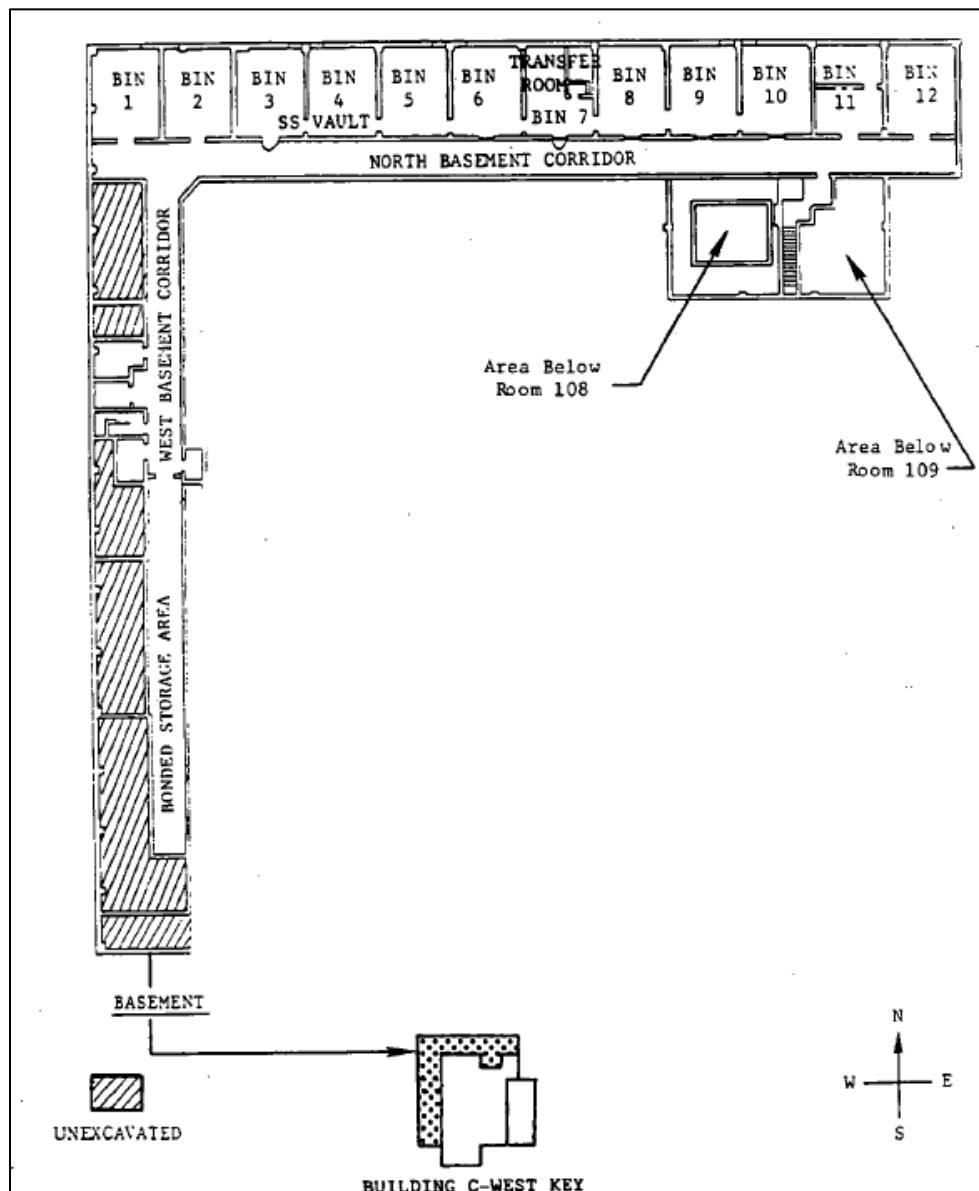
Basement layout, Building C-West [GE 1984, p. 13].
